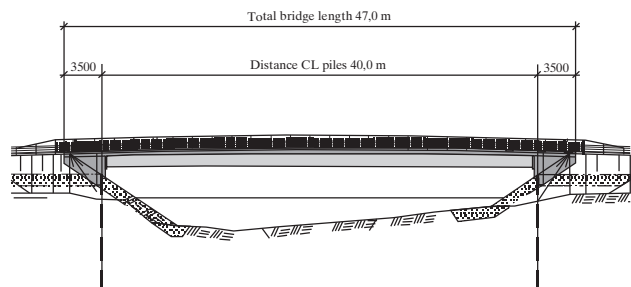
The integral abutment bridge over Leduån (Units: m)
